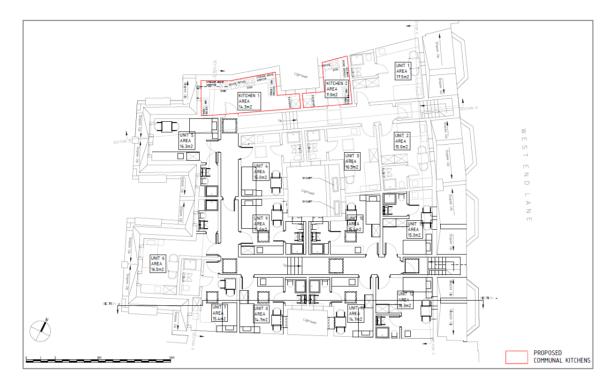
Proposed fourth floor layout - AS-Studio Ltd. (March 2018)
